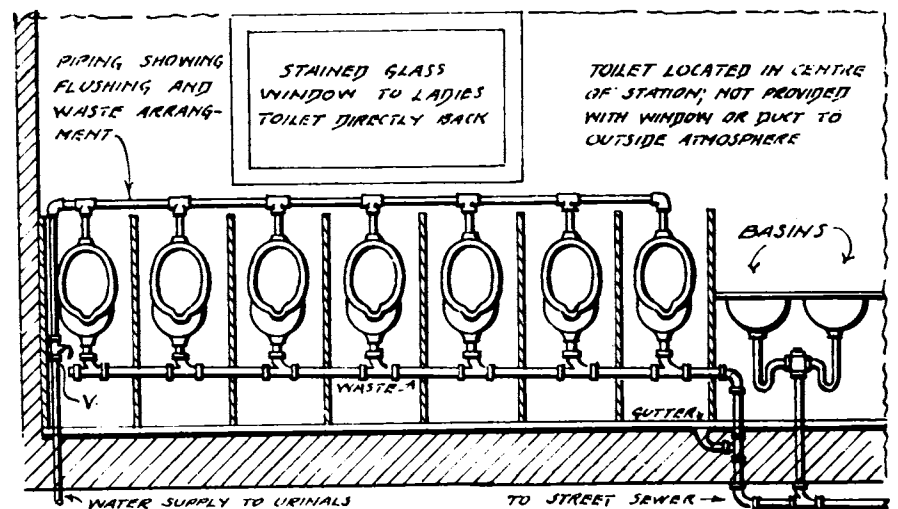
Elevation of Battery of Urinals, Not Trapped Nor Vented, in the Grand Trunk Station
